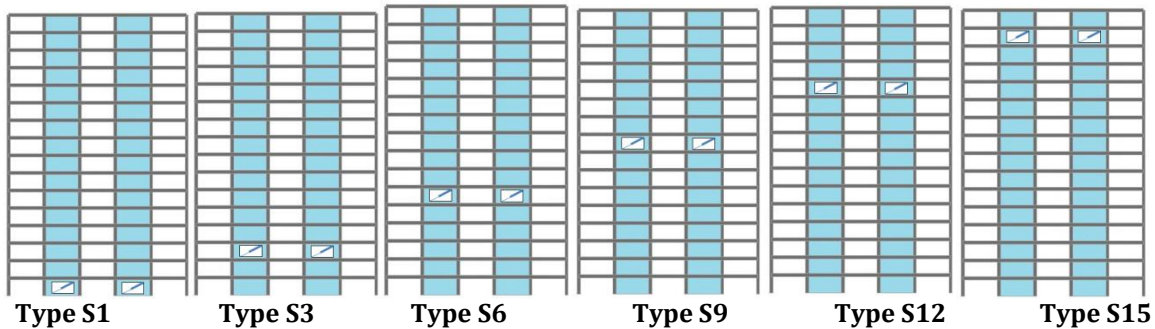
Placements of single damper within 16-storey frame-shear wall structures
